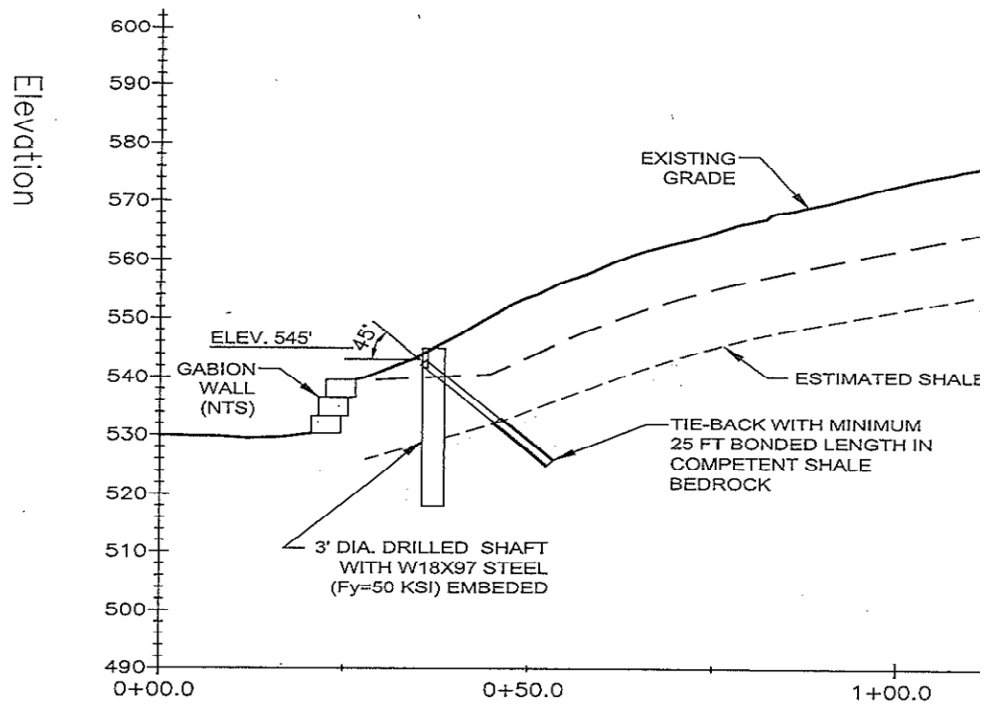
Tied Back Drilled Shaft Section (typical)
